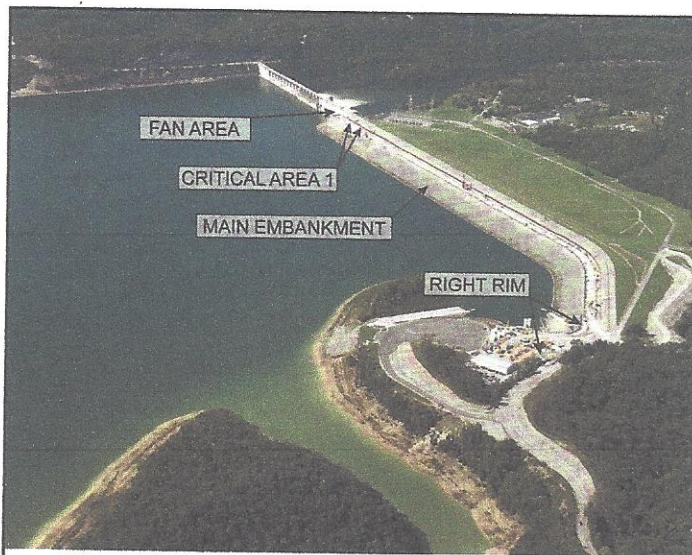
Wolf Creek Dam in September 2009. TSJV Plant in foreground. HMG grouting program and barrier wall construction installation in center.
